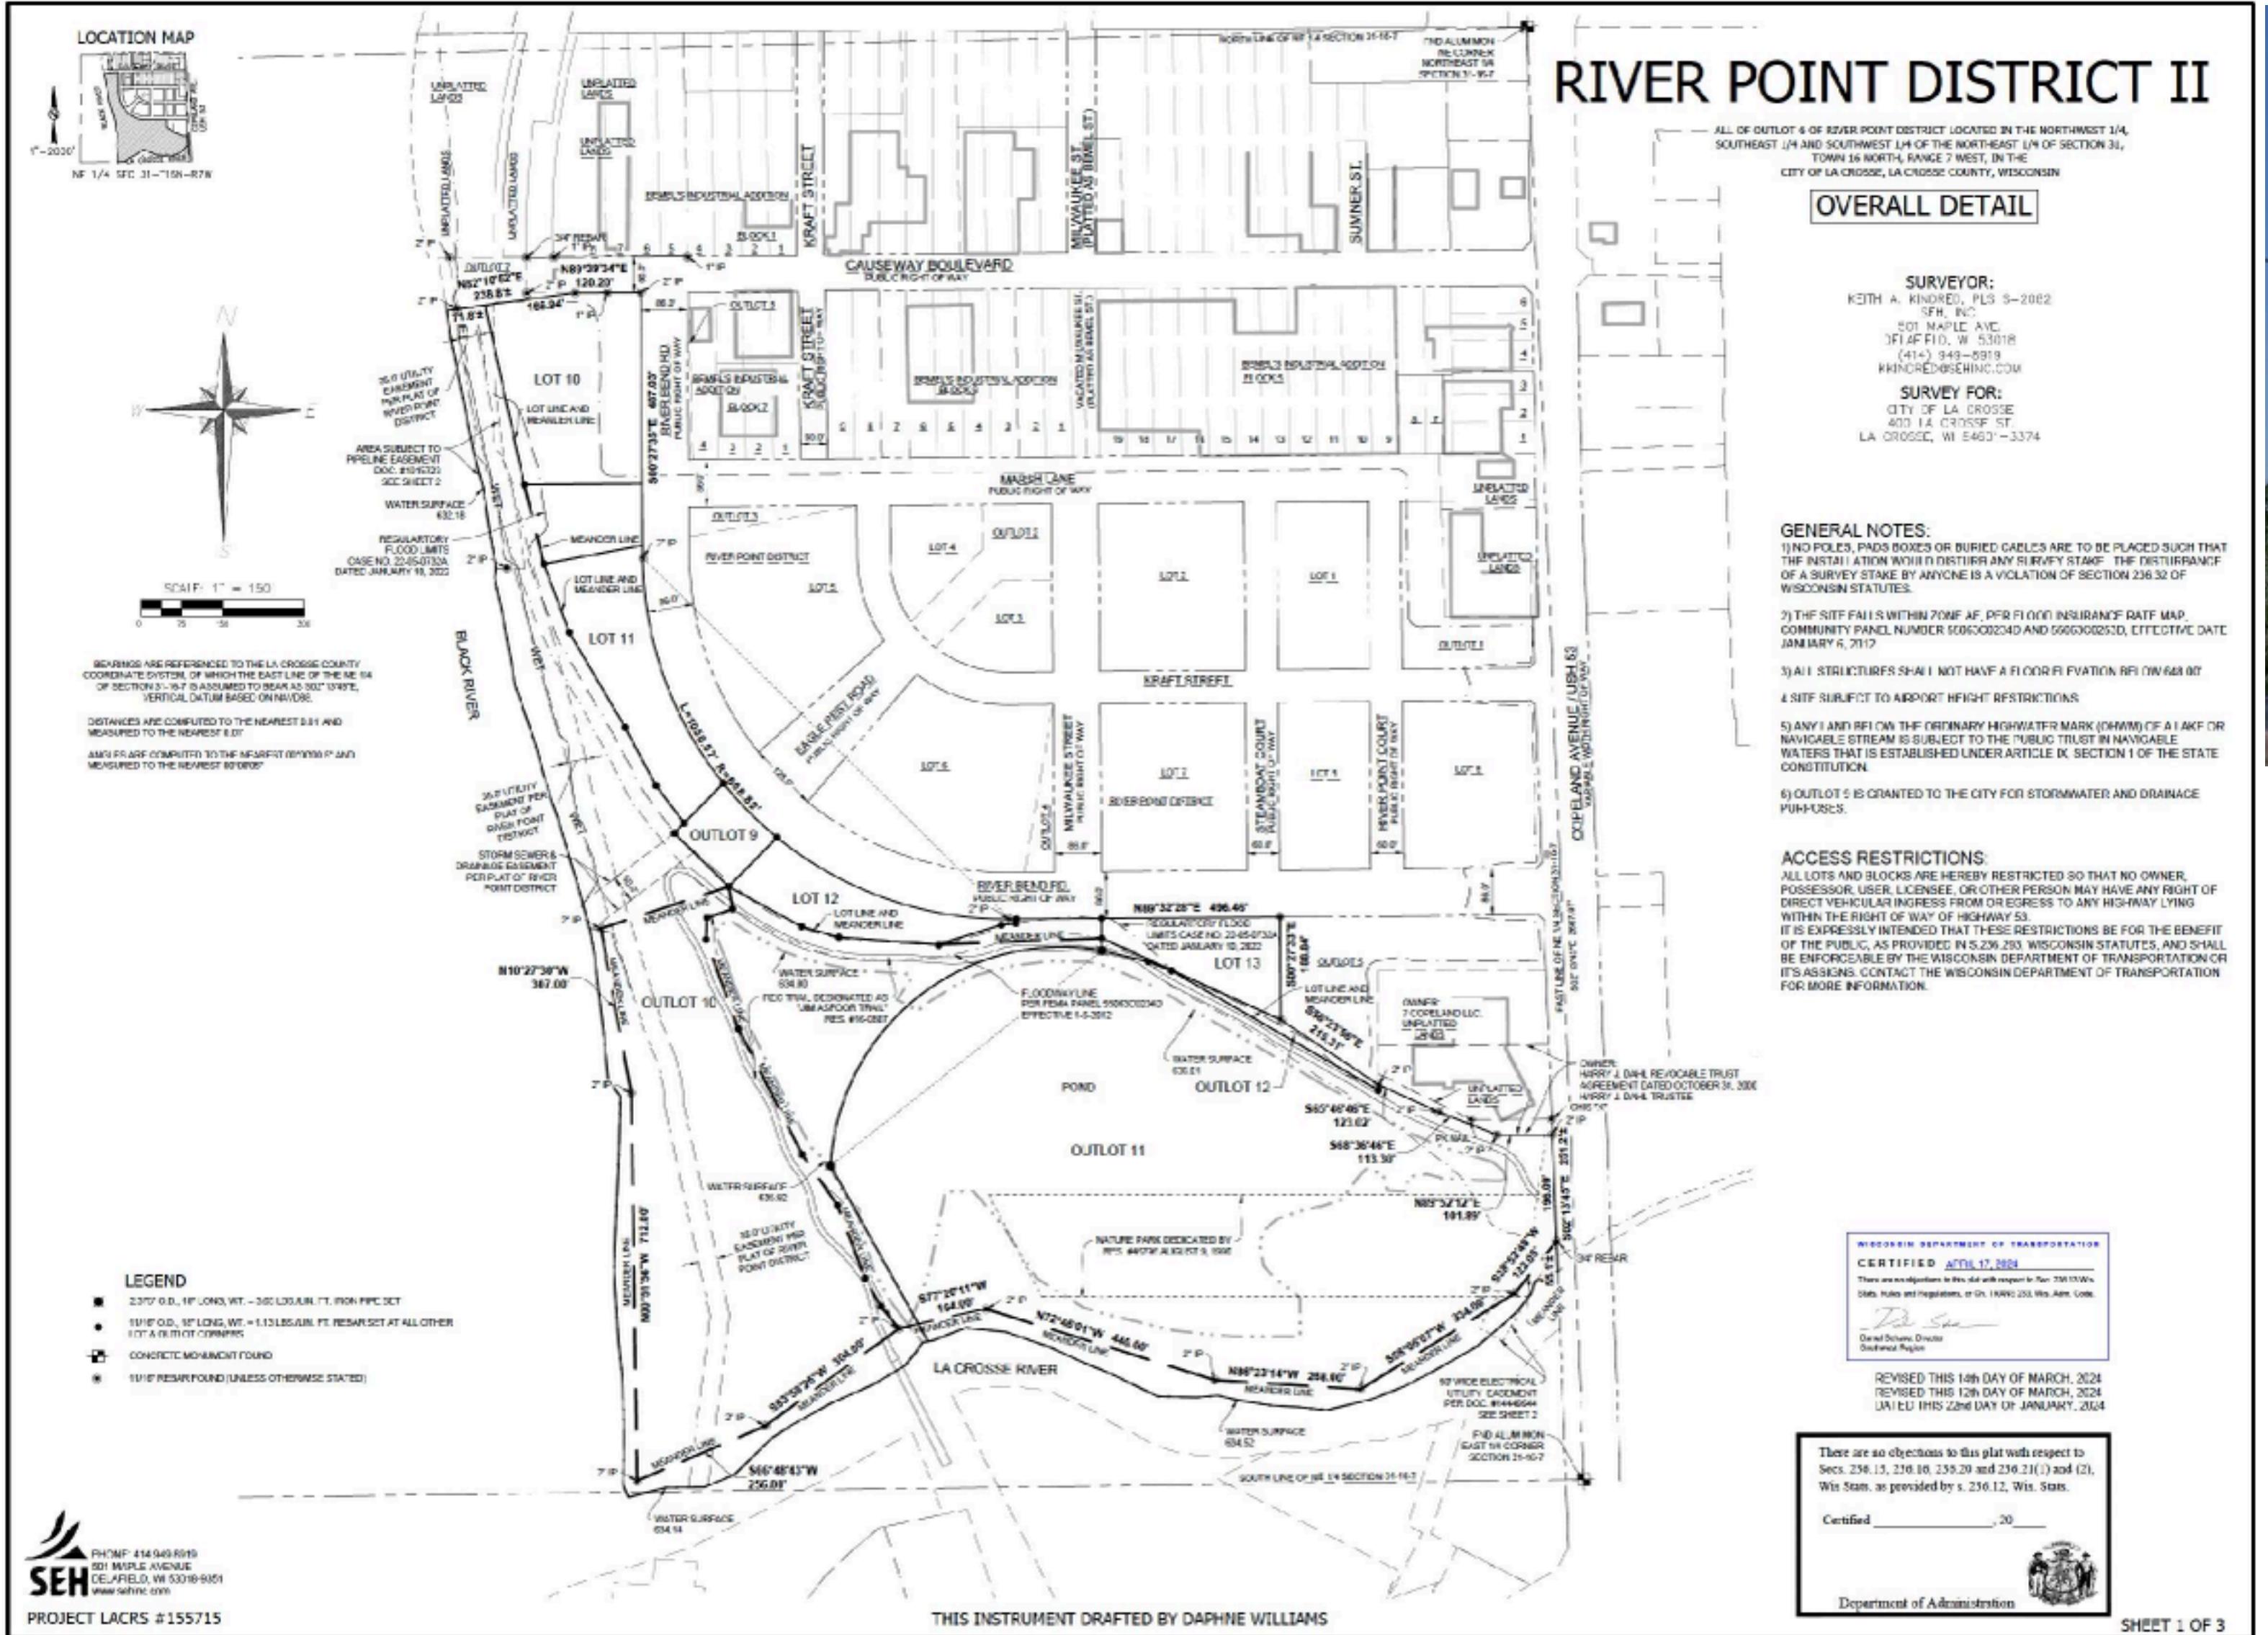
Site plan with labeled zones corresponding to the development summary.
